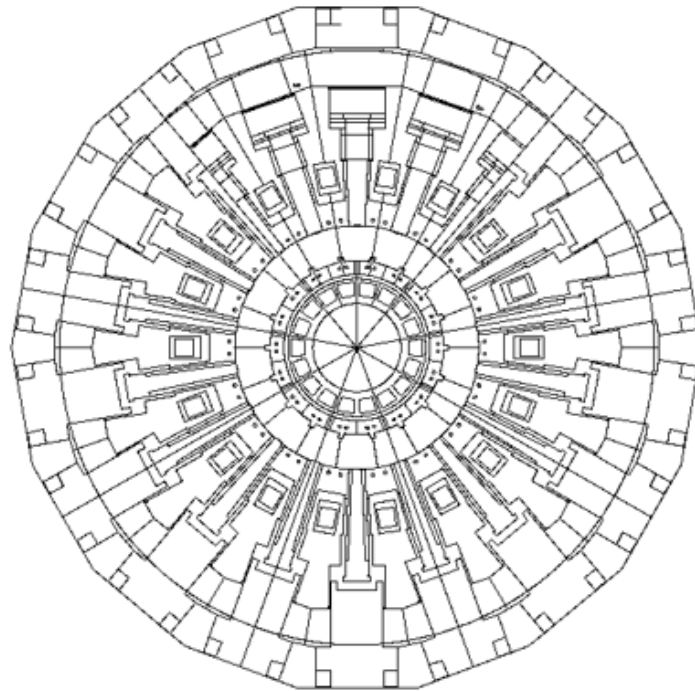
Horizontal cross-section of the E-lite block structure (L2 level).
